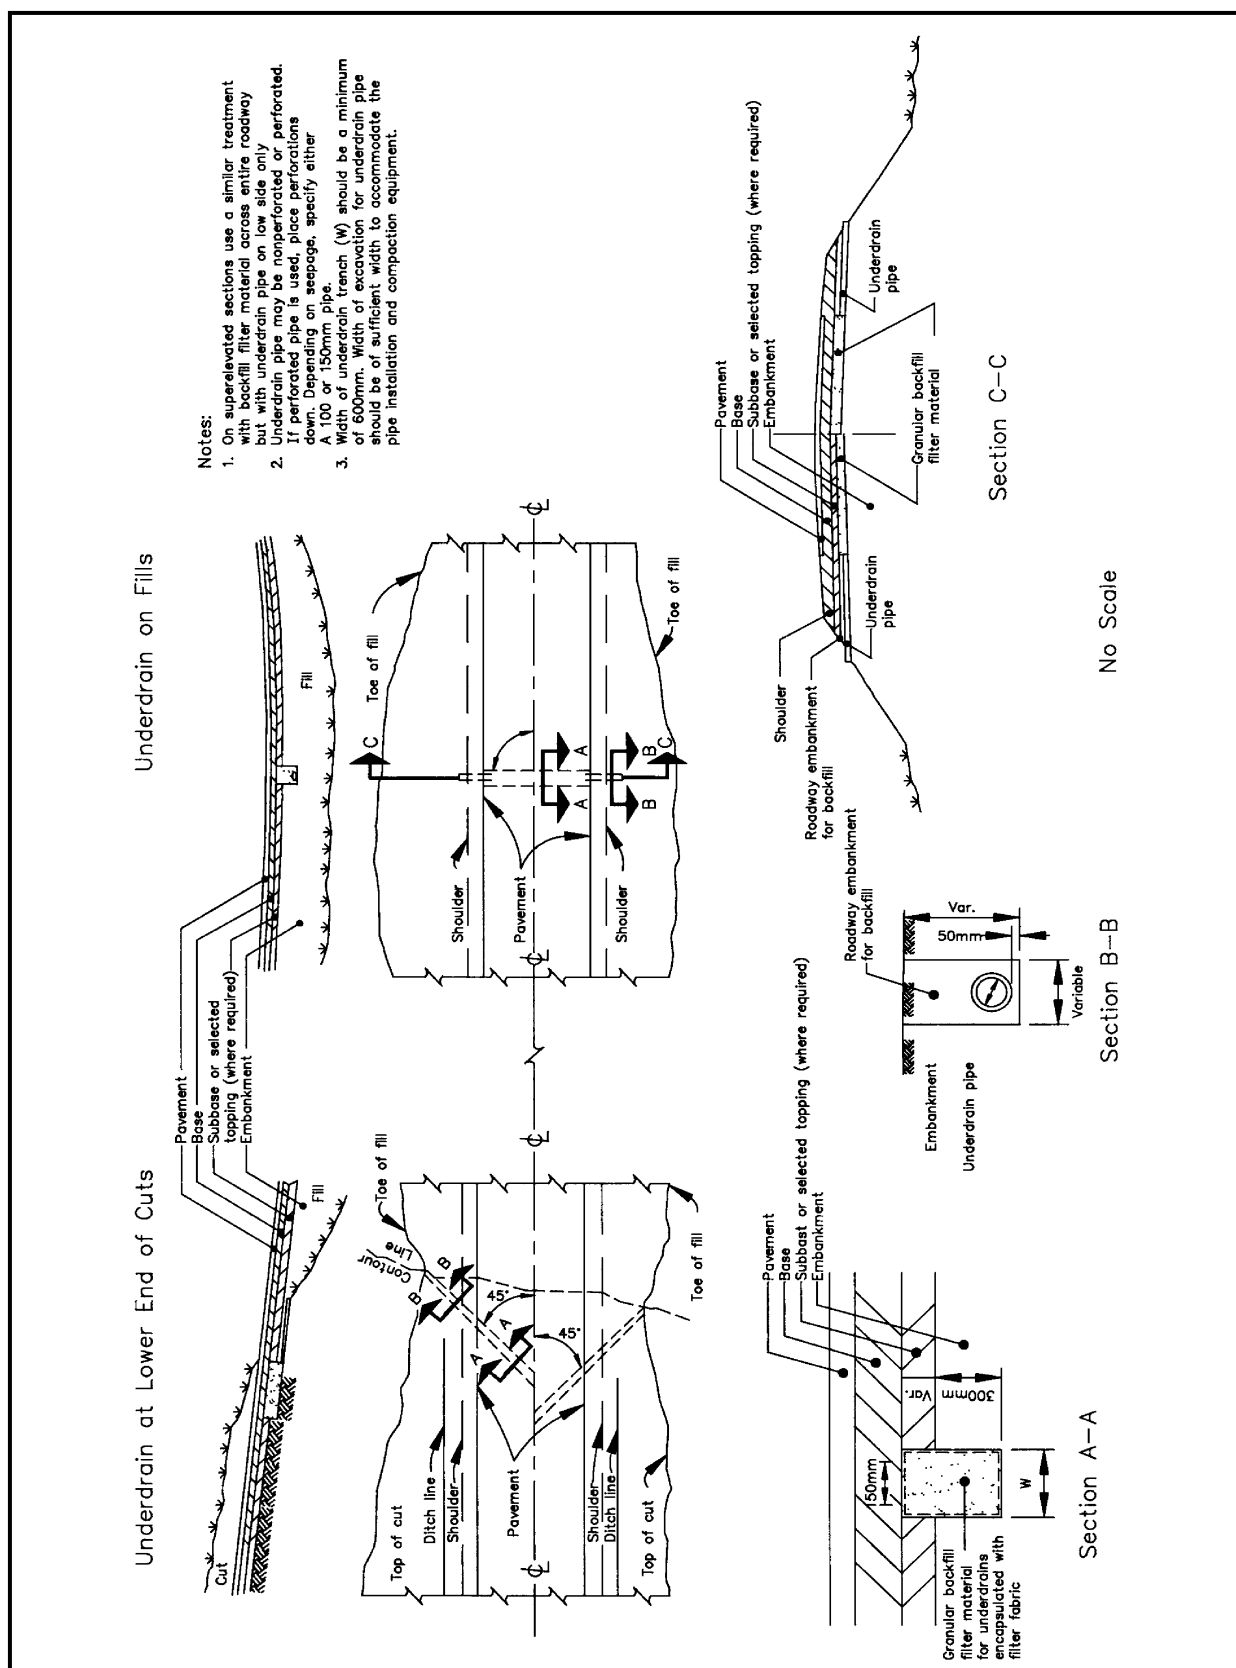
CC TYPICAL UNDERDRAIN INSTALLATION FOR ROADBEDS AND DITCHES
